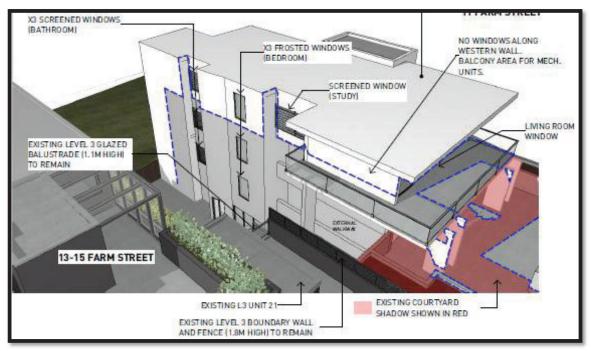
Existing overshadowing onto 11 Farm Street at 3pm.
